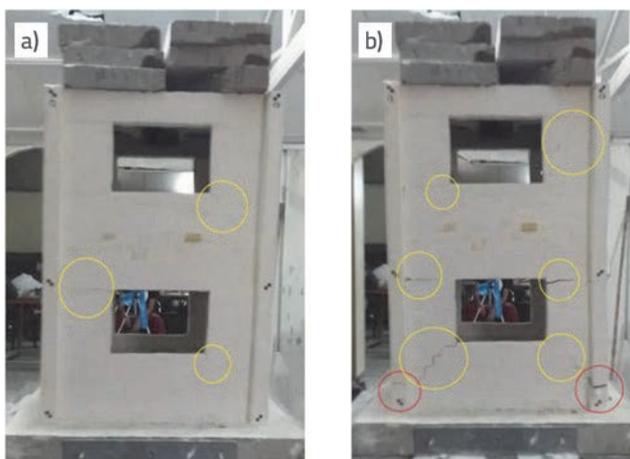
a) Brick walls of Specimen 1; b) Columns of Specimen 1 where first cracking was observed
